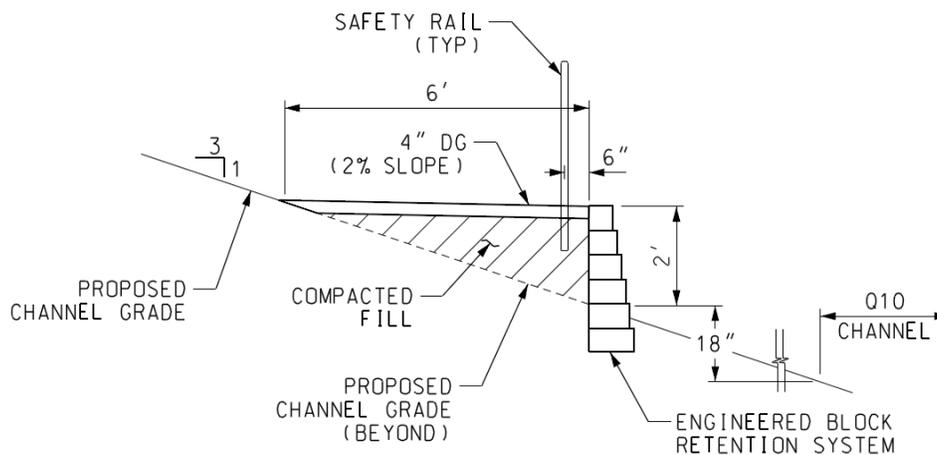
Typical 6-Foot-Wide Decomposed Granite Road with Retaining Wall
